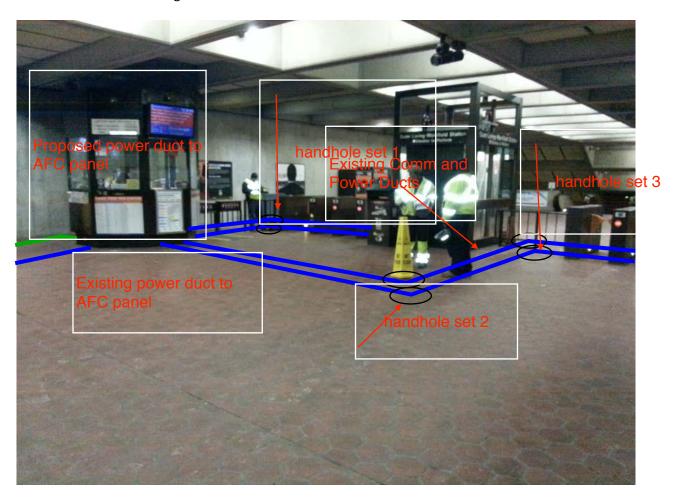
K07 Dunn Loring: Proposed and Existing runs towards AFC panel
